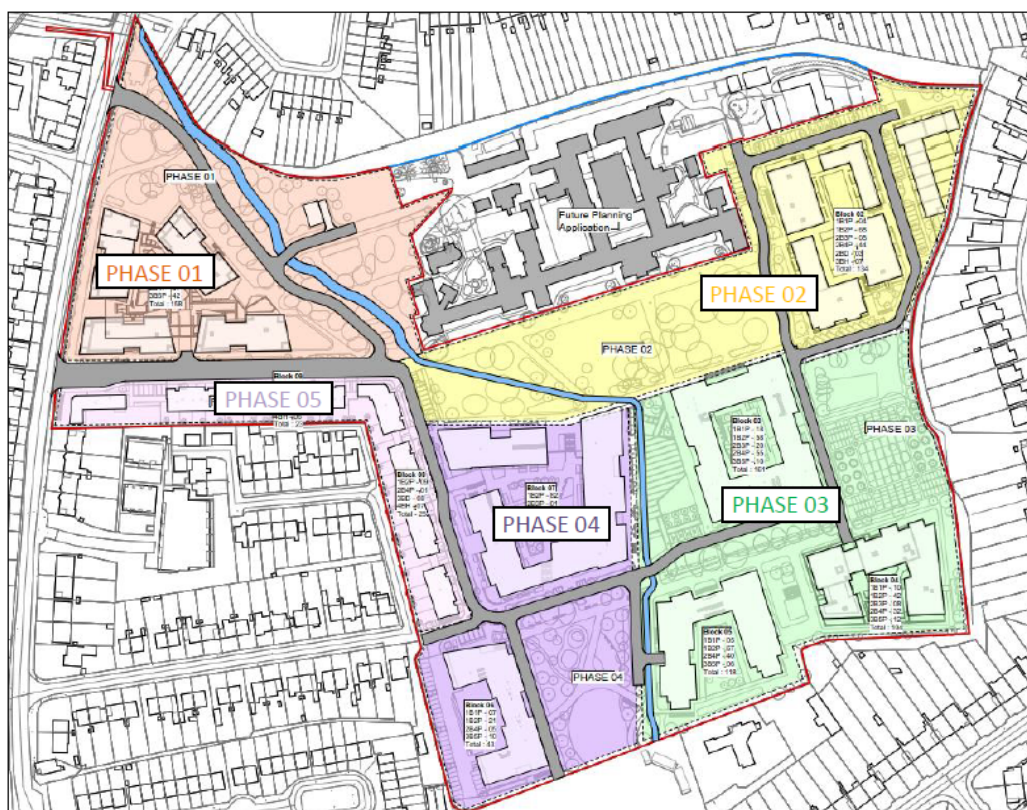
Illustrative Plan showing proposed construction phasing.
